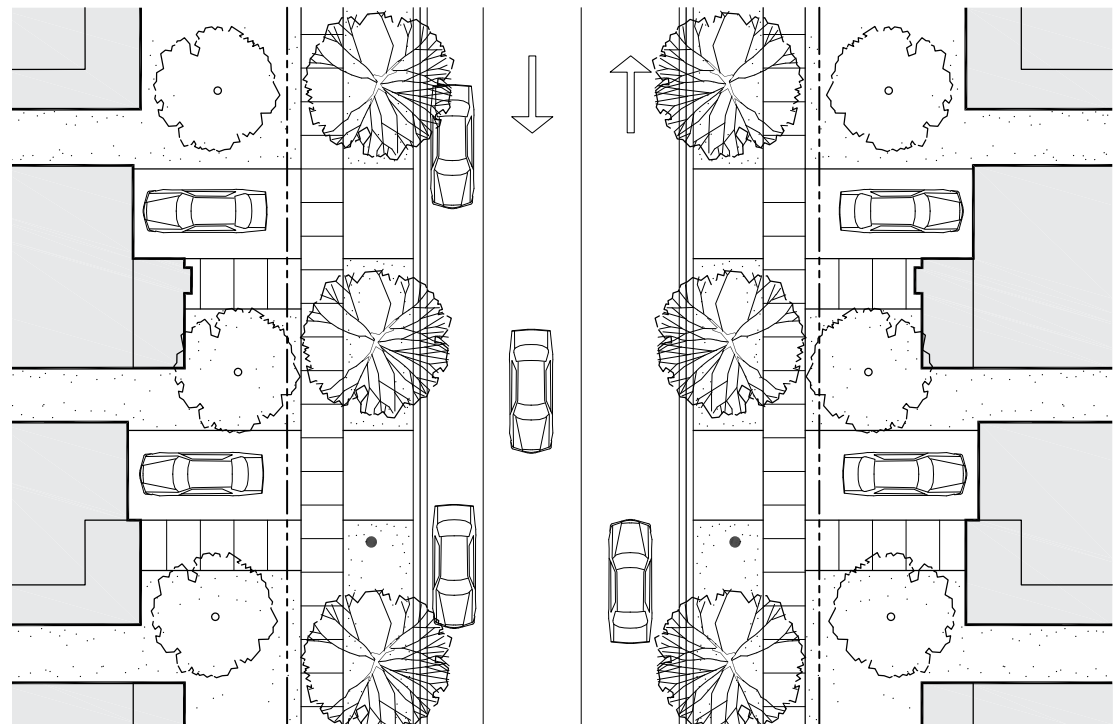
Minor Collector Road - 19.0m R.O.W. / 2 travel lanes / on-street parking on one side / 4.55m boulevard.
